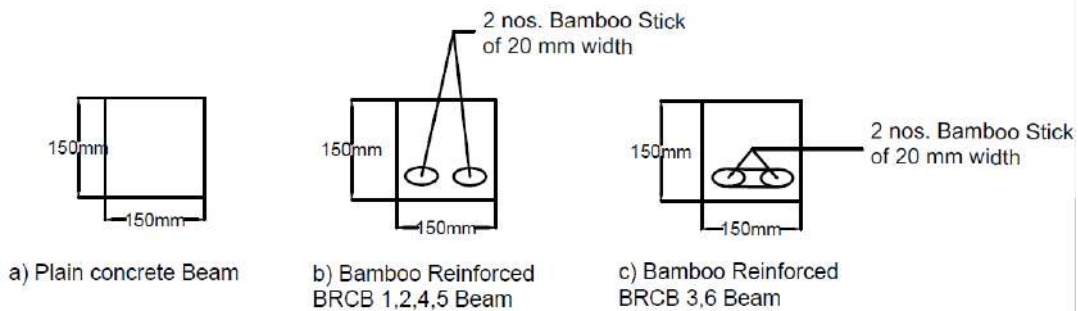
Concrete Beam cross section with and without Bamboo Reinforcement for different beam designations
